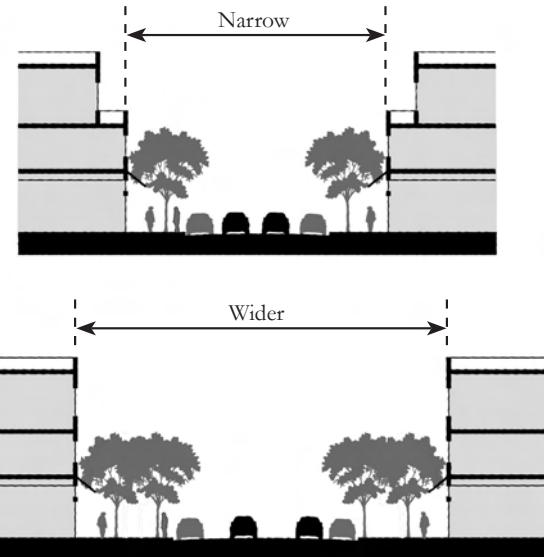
Buildings should not overwhelm the pedestrian experience on the street and should account for the relationship between building height and street width.
